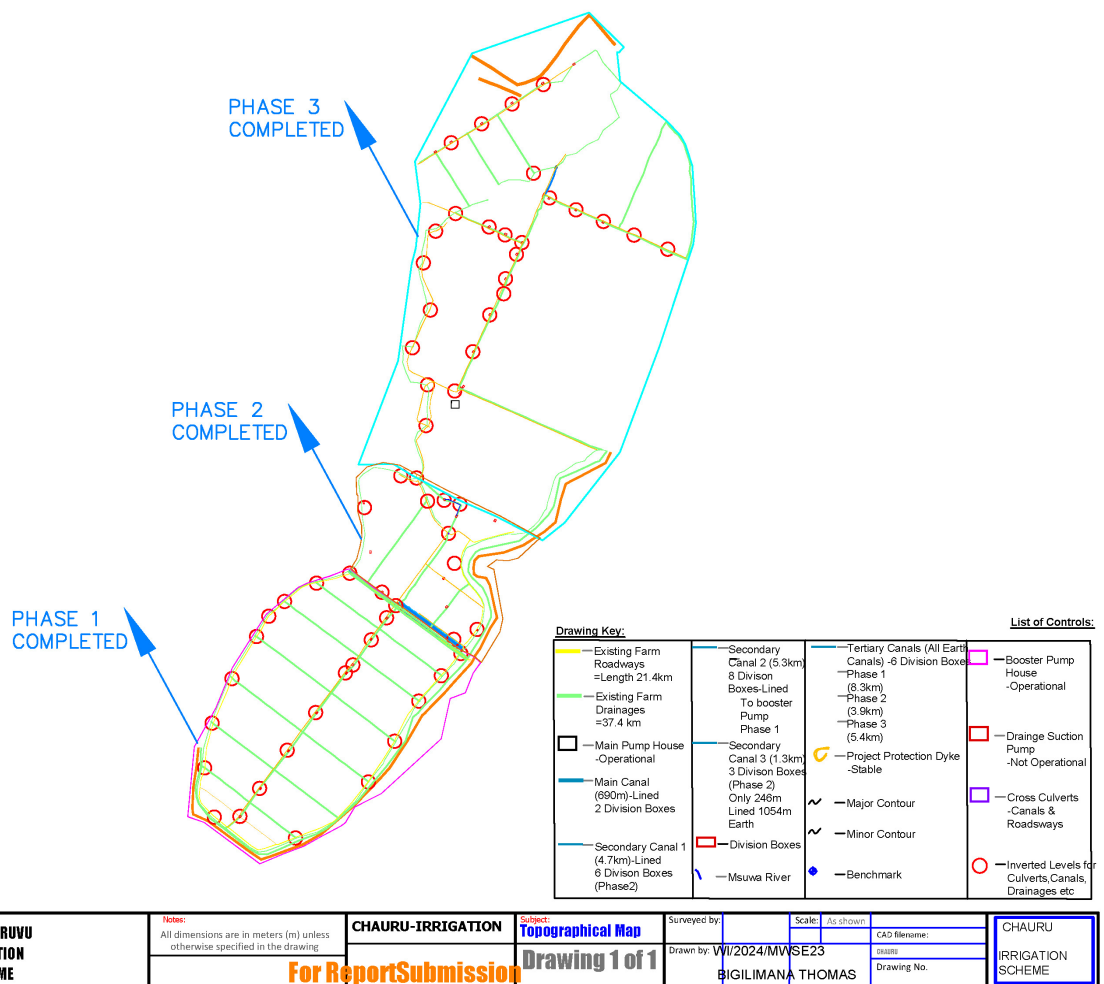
Chauru irrigation scheme layout exists (source: Auto CAD drawing).
